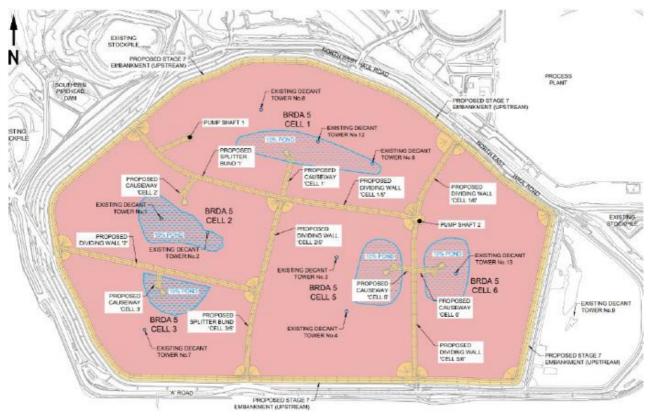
BDRA 5 Stage 7 Construction Plan
